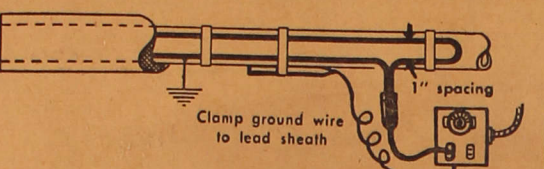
A 60 foot cable applied this way will protect 28 feet. Space off distance to thermostat as first step in applying cable. Maintain at least 1" spacing between 28' loop of cable along pipe run.
